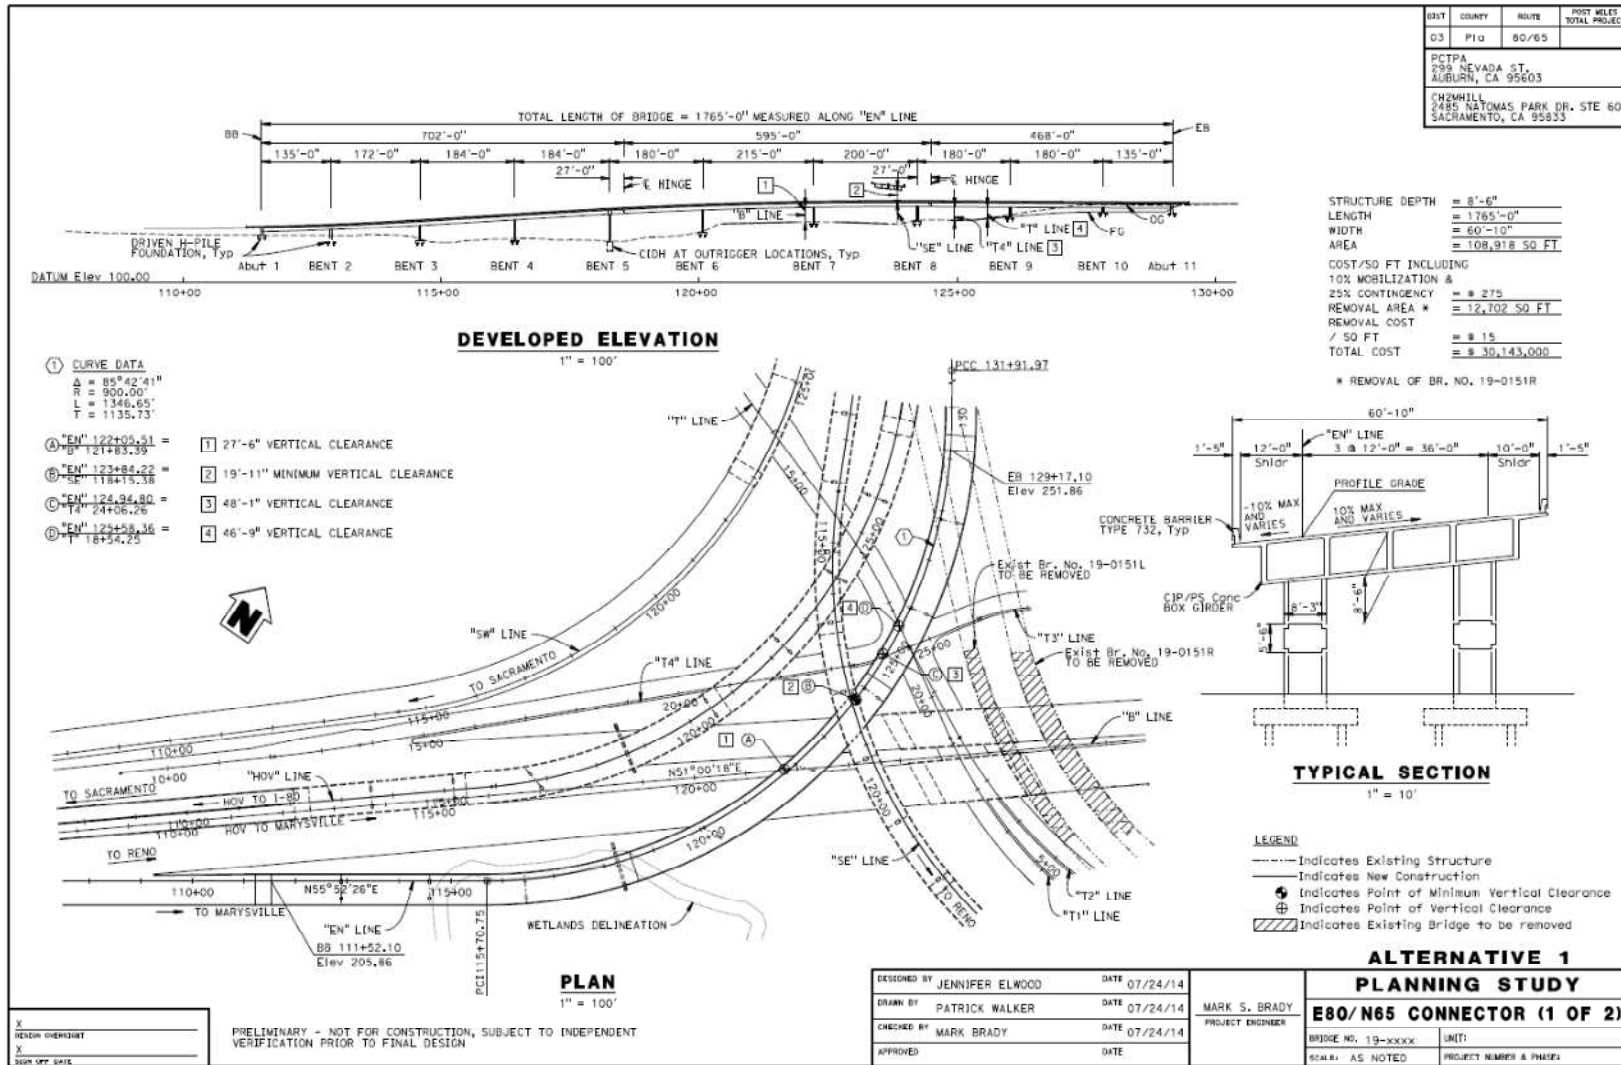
Proposed EN Connector Plan (Alternative 1) (1 of 2)
